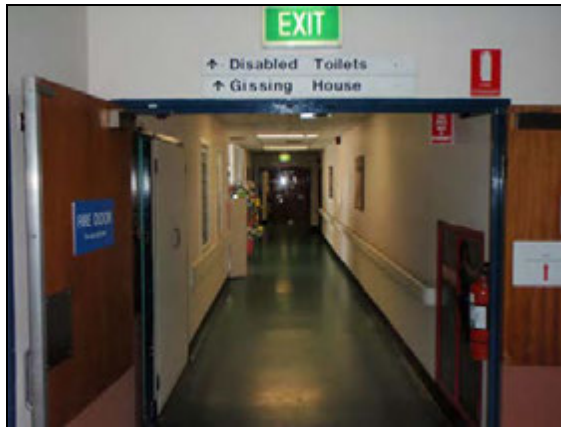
Typical corridor within the Main Ward Building, showing rubber skirting, drop-down ceiling panels and single panel timber doors.
